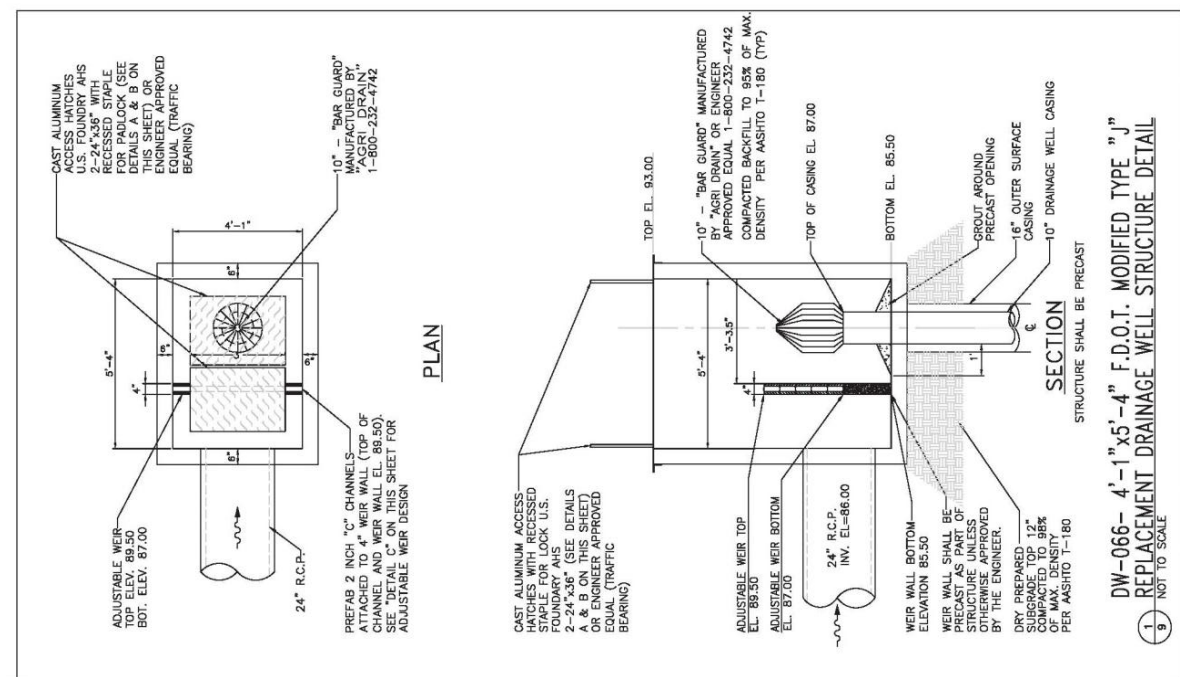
Drainage Well DW-66 Details (Devo Engineering, 2012).
